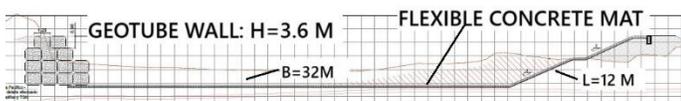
TYPICAL CROSS SECTION AT CROSSING
